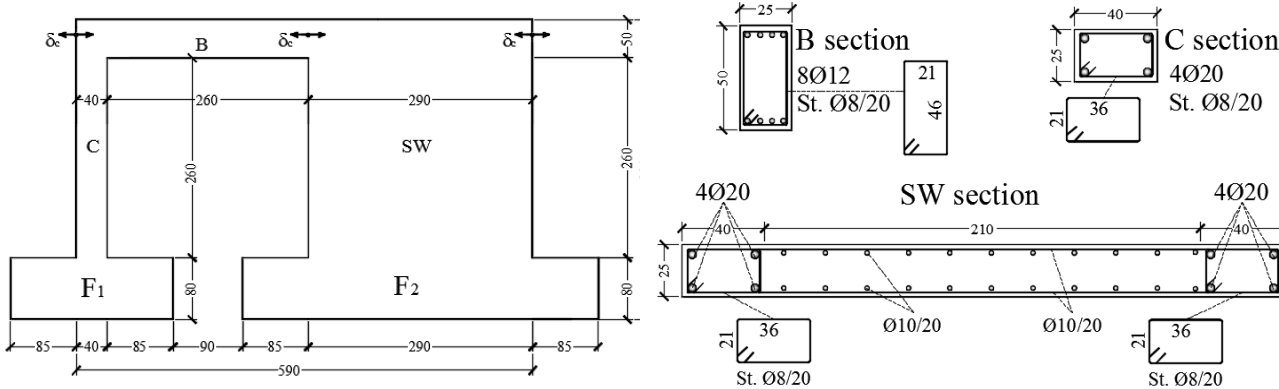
One-storey frame. Geometric (cm) and reinforcement details (Ømm/cm).
